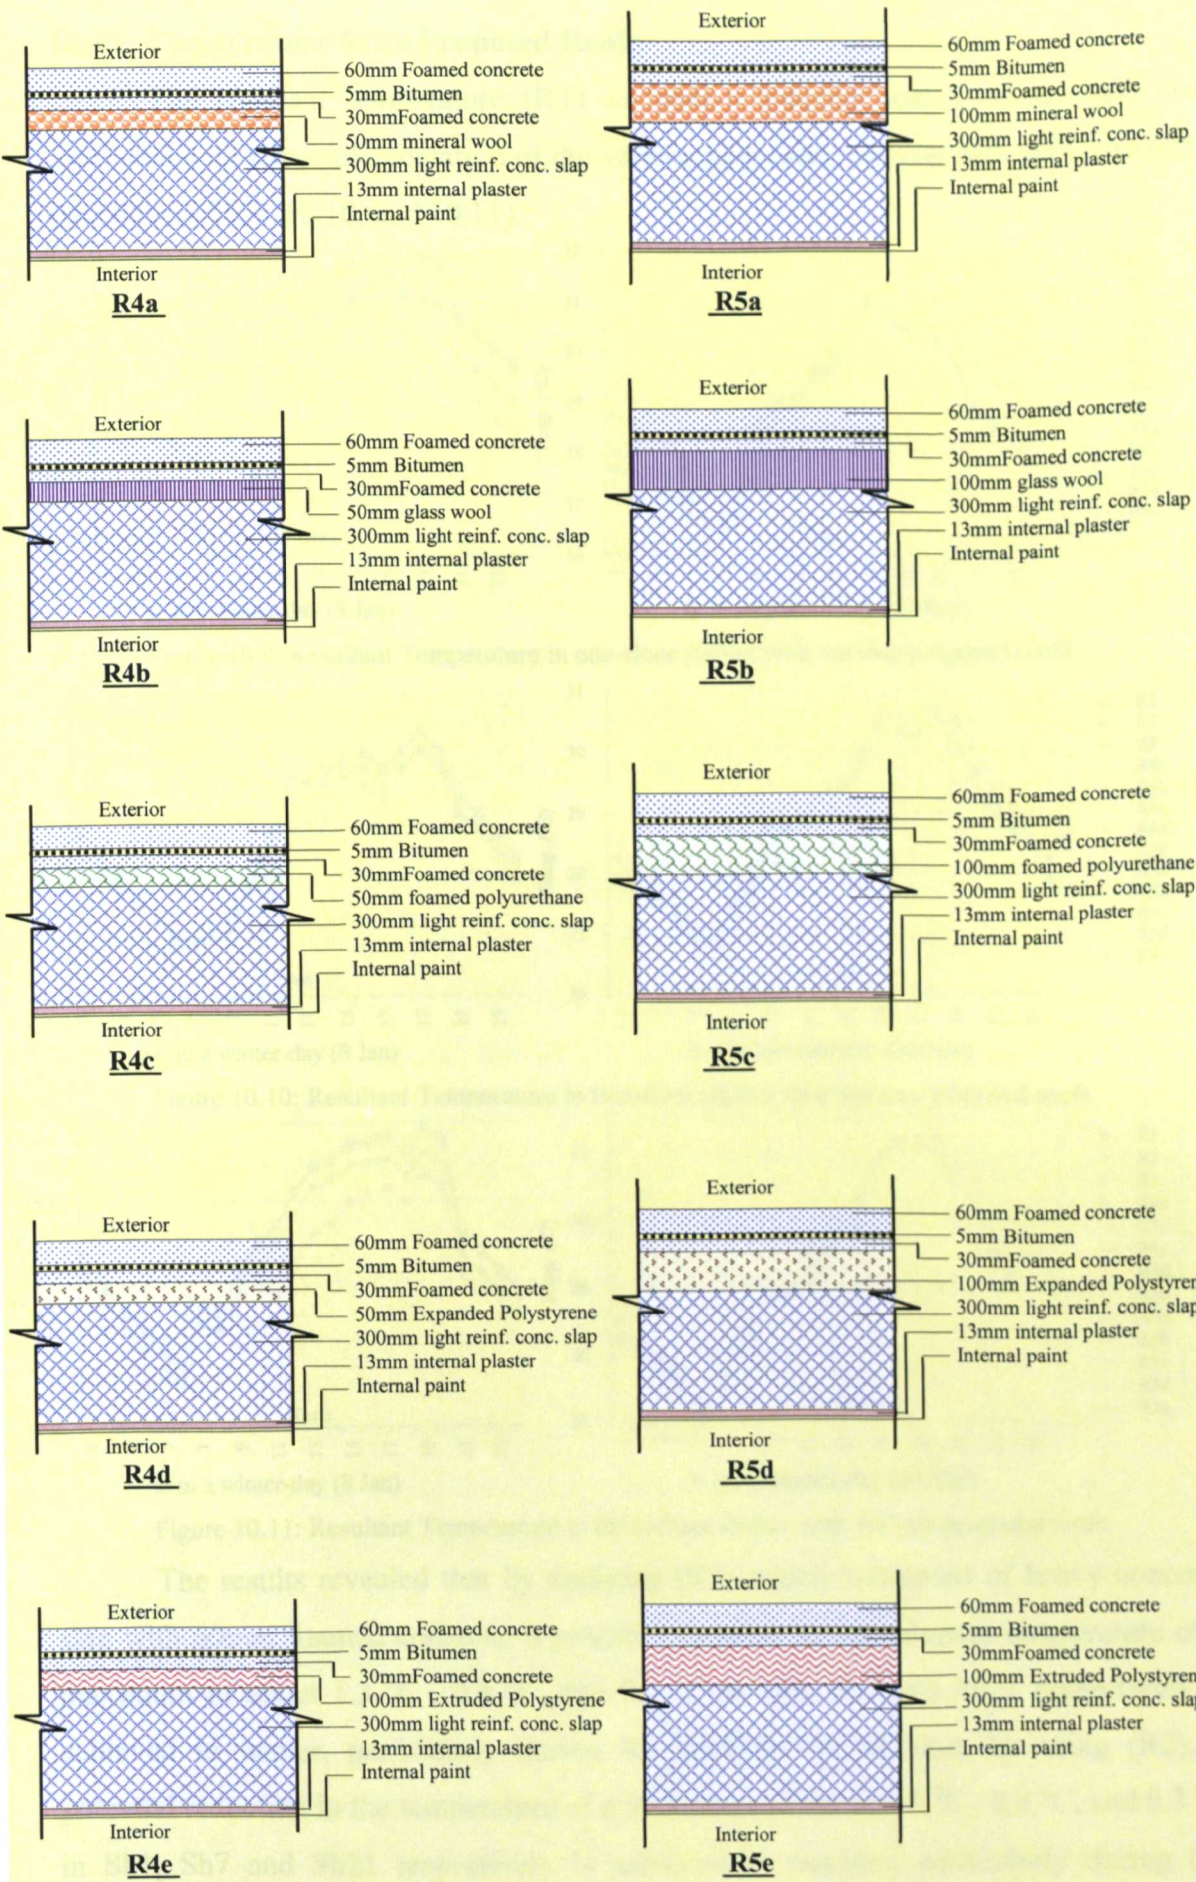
Detailed drawings for roofs (R4a to R5e) which incorporate resistive insulation
